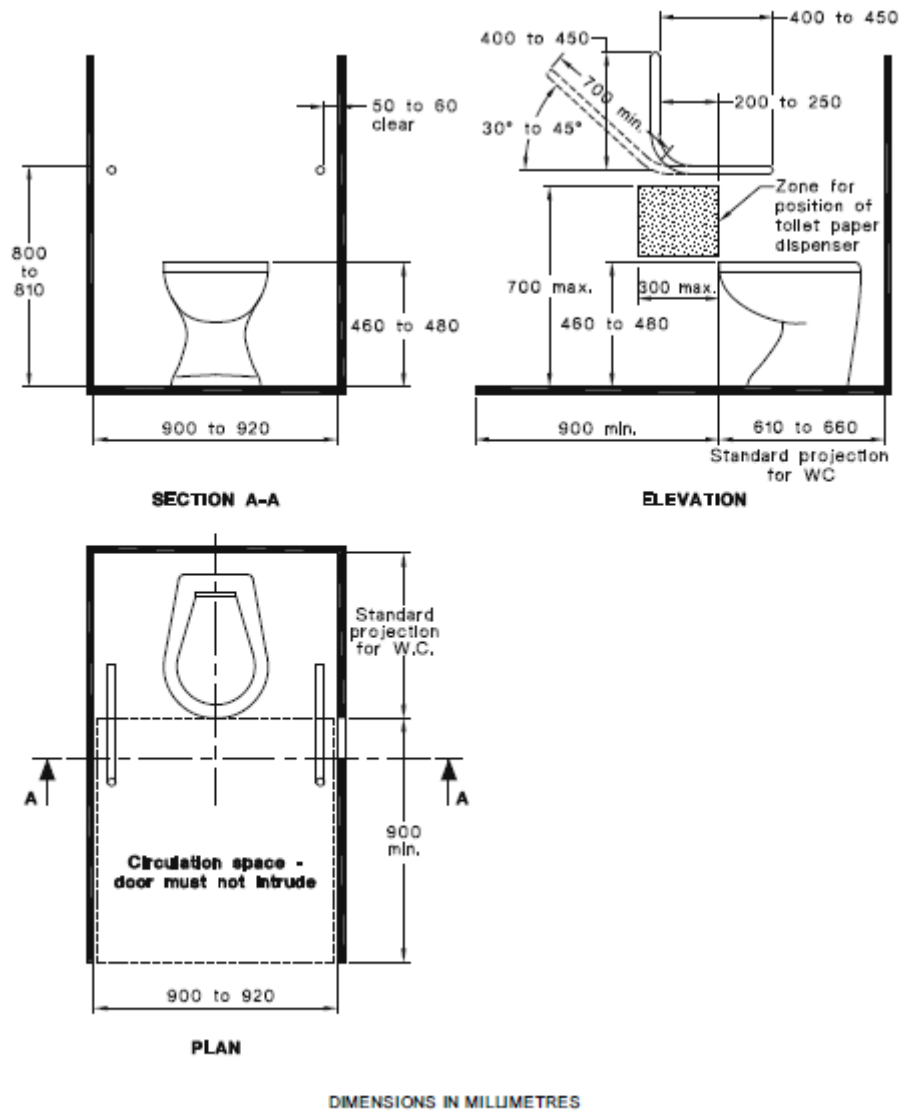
(A) SANITARY COMPARTMENT FOR PEOPLE WITH AMBULANT DISABILITIES—PLAN AND ELEVATION
